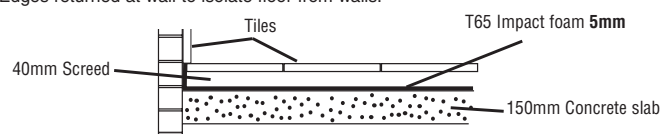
Concrete and floating timber floor L'nT,w+Ci=49 - To insulate new or existing concrete slab wet area floors before tiling.
